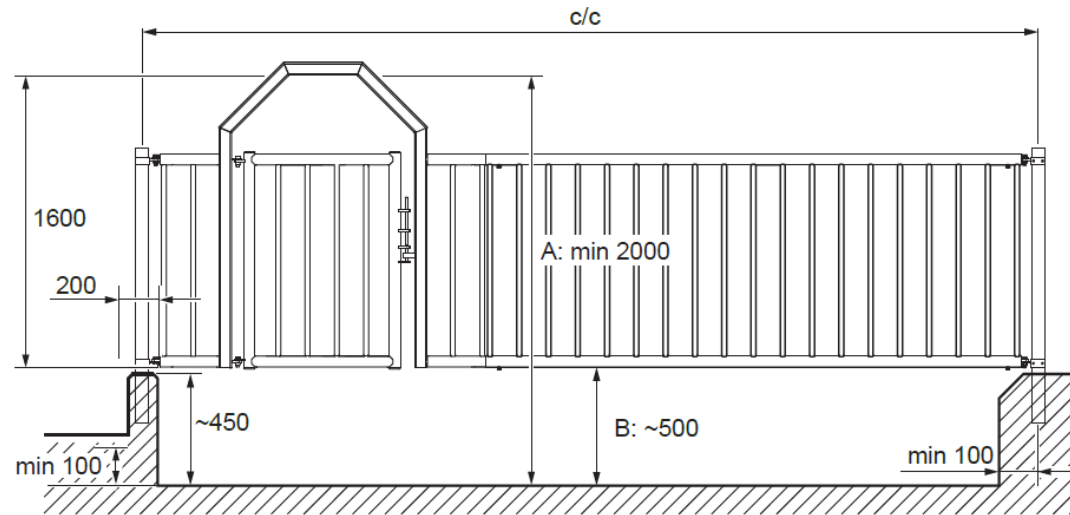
Dimensions for concrete floor with gate extension (mm).
